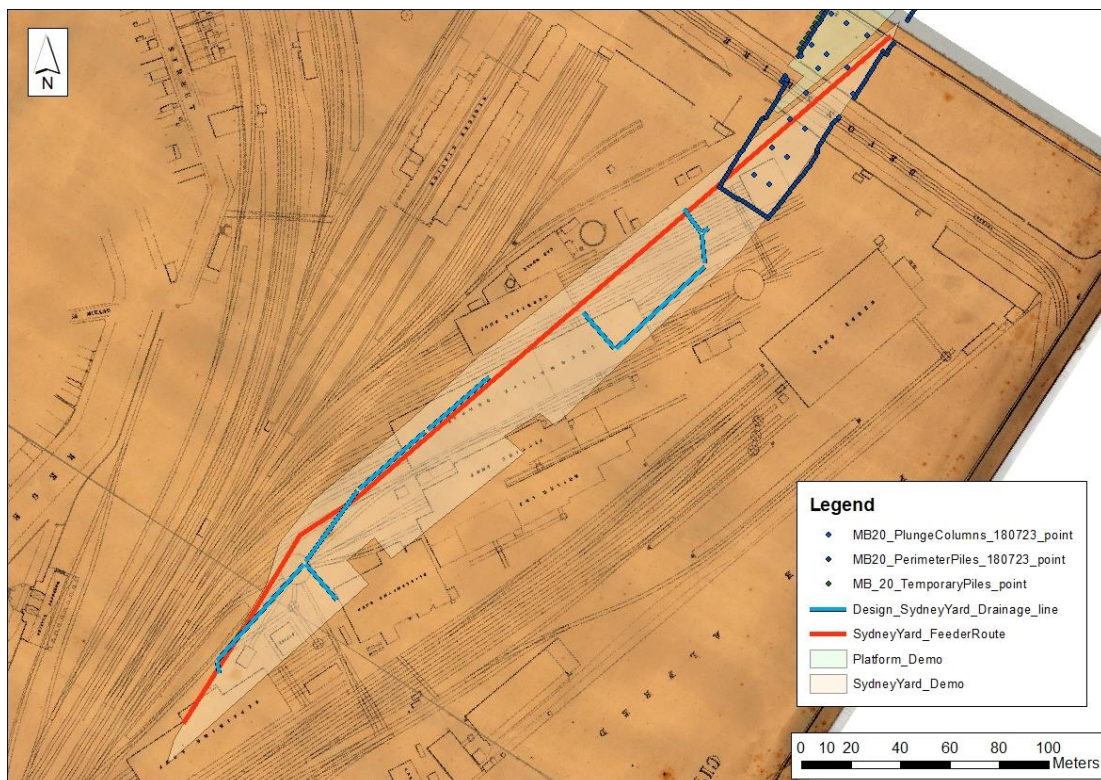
Central Station Main Works station box overlain on the 1884 Waterboard Survey plan Sheet I2 showing Engine Erecting Shop
